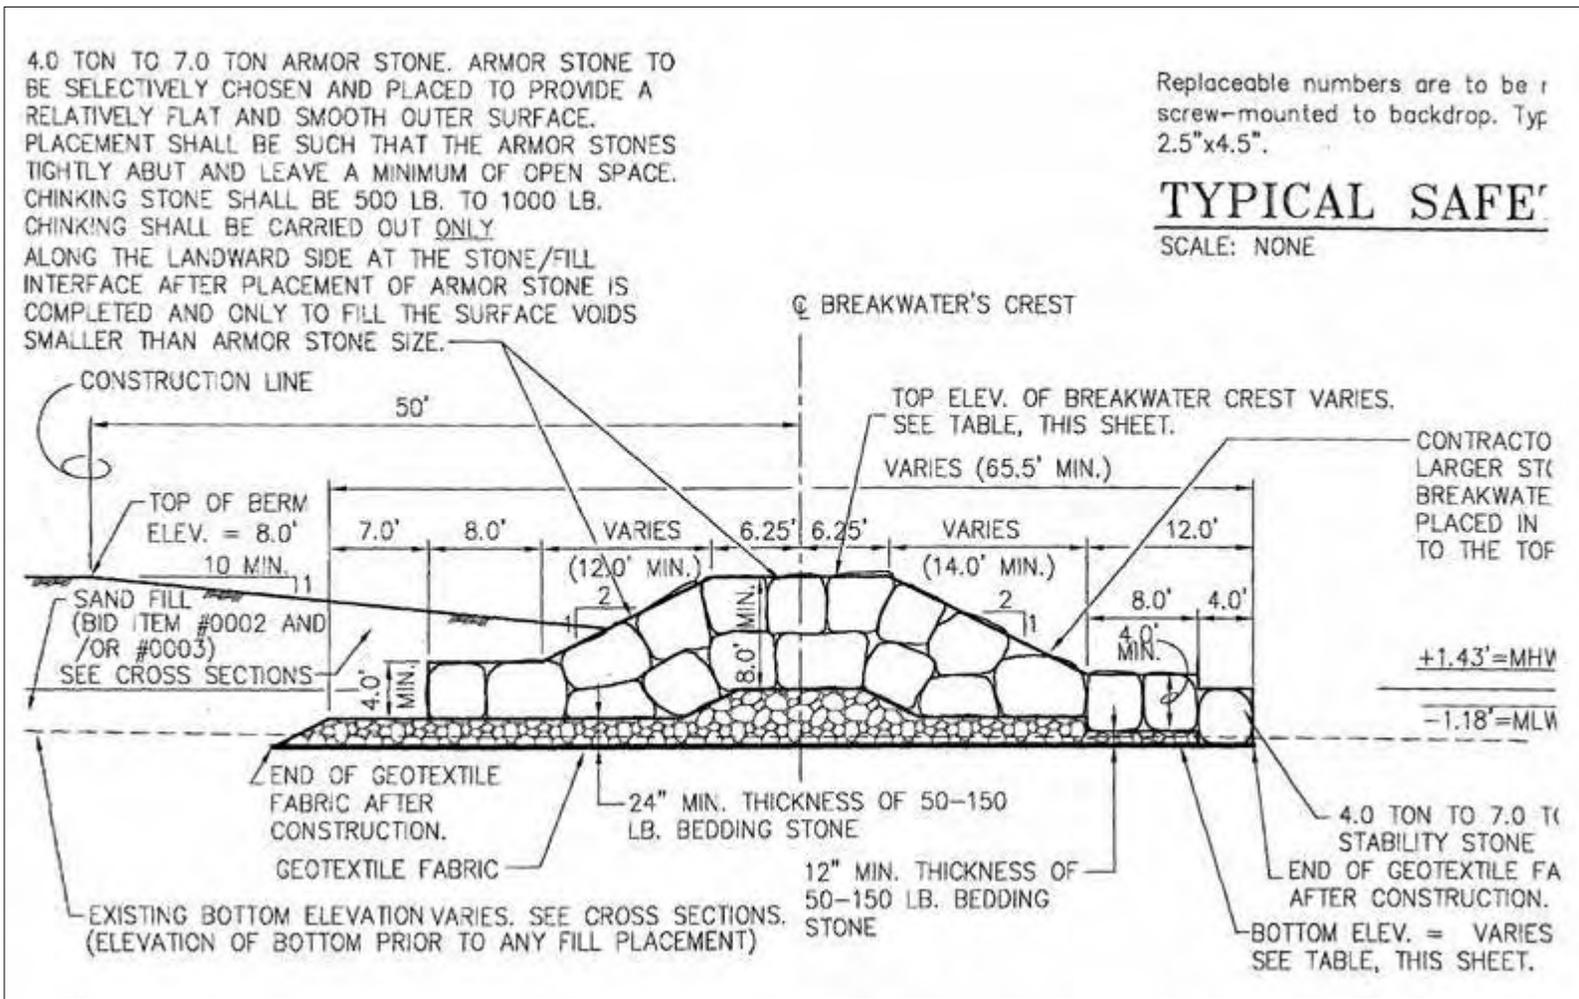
Typical cross section of detached breakwater used at Fort Story, VA. A similar design can be used at Wallops Island.
